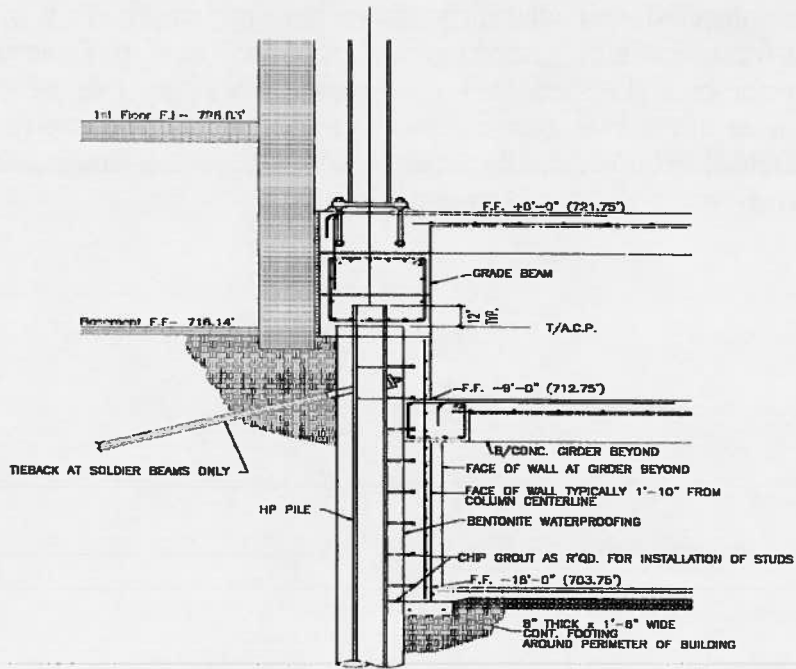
Typical Section at Soldier Beam at Hammond Building
